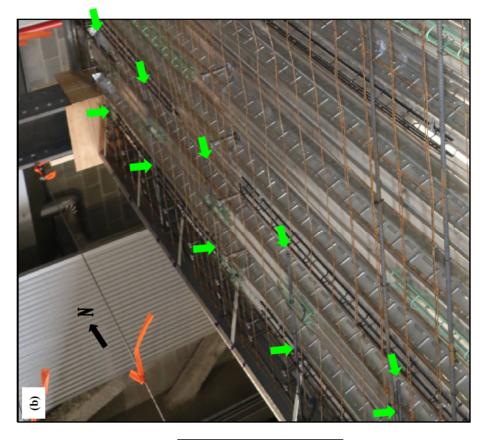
Construction photo of the northwest corner of the test frame showing the location of the continuous No. 4 rebar in the southwest bay.
